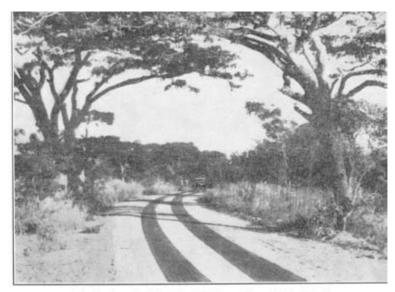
Asphalt strips, Salisbury-Marandellas Road.
